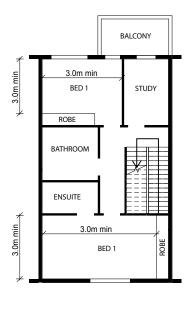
C.6-3: Minimum dimension controls for bedrooms - Level 1
